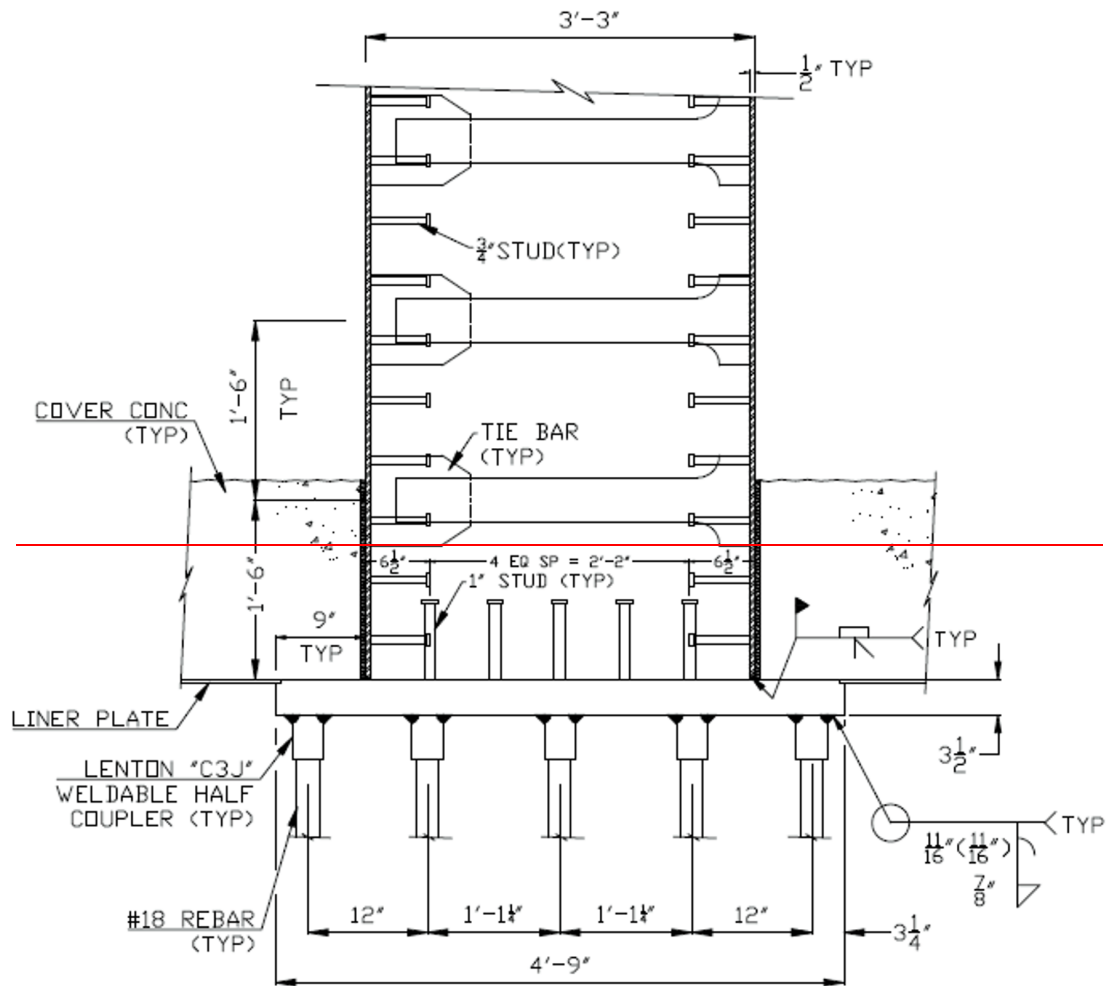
Typical Details of SC Modules (Sheet 5 of 5)
